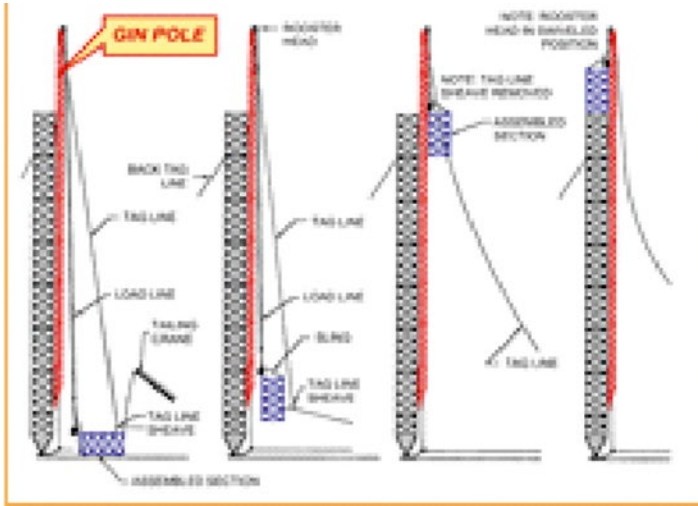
Section Method – Illustration of the erection of the central mast of a guyed tower using a gin pole; mast sections were preassembled on the ground.
